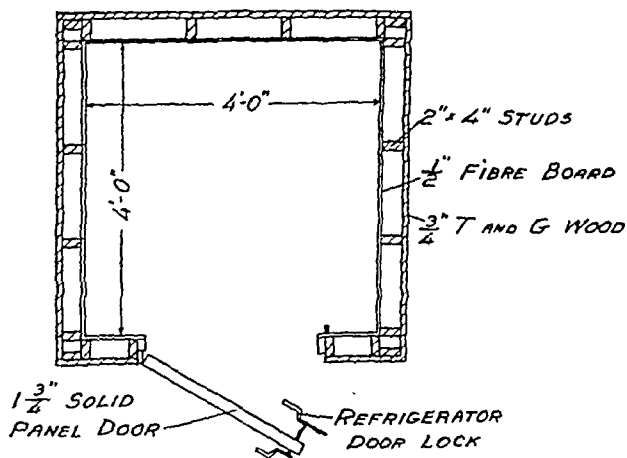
A simple and inexpensive type of booth which can be constructed for about \$100. The ceiling should be constructed in the same way as the walls; for the floor the fiber board should be applied directly to the T and G subflooring. The door jamb should be lined with soft rubber so that the door will lock tightly against the jamb and thus eliminate all threshold cracks. If there is much vibration in the room where the booth is to be located it will be helpful to support the booth on 1 inch thick live rubber pads, one at each corner of the floor, of such size that the rubber is loaded to 6 pounds for each square inch of bearing surface. (Thus, if the booth and its contents weigh 600 pounds, each pad should measure 5 inches by 5 inches by 1 inch.) This booth will provide an insulation of about 30 decibels.
